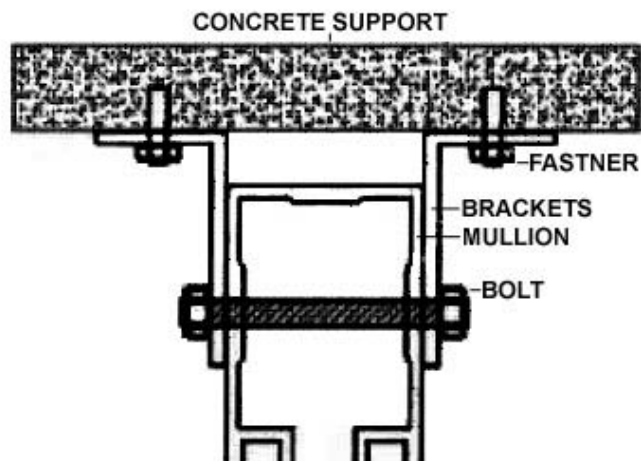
CURTAIN WALLING - SUPPORT CONNECTION DETAIL
